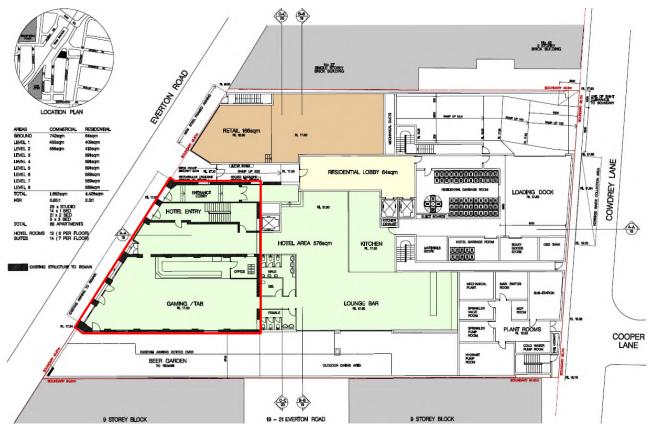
Ground Floor Plan showing The Hotel Core outlined in red. Hotel areas are tinted yellow and retail shops tinted tan.
